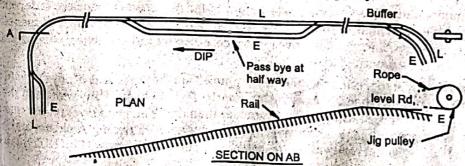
Plan and section of layout of gravity haulage Essentials of a good haulage track:
